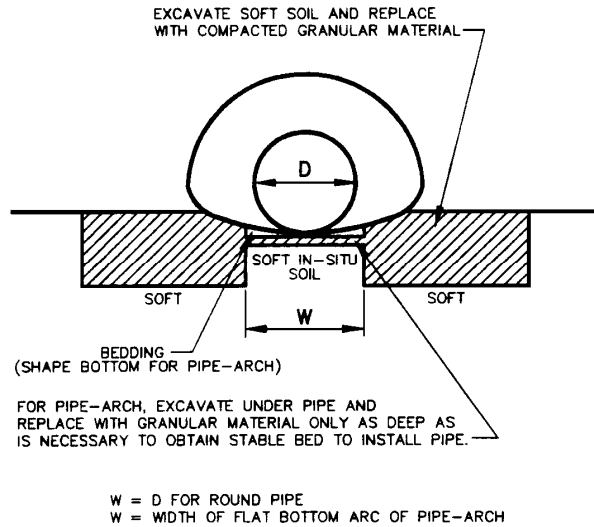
Foundation Treatment for Settlement Control
